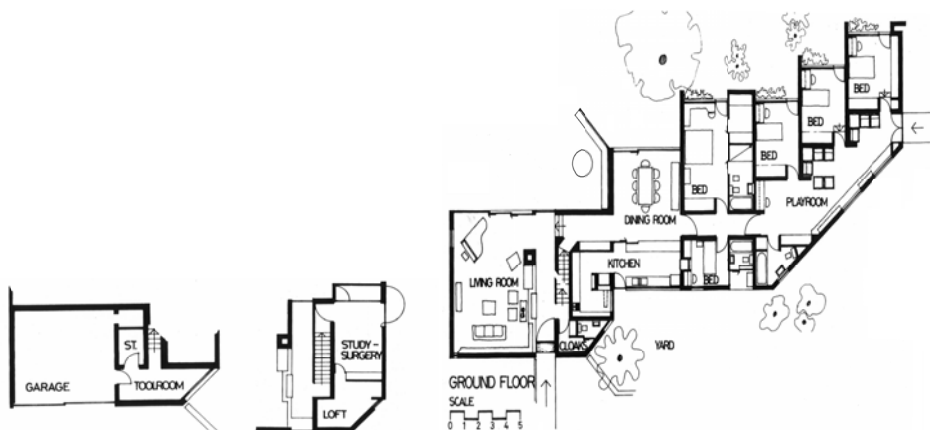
Previous page: House Raynham, Newlands, Cape Town (1967), lower ground, first and ground floor plans (Fagan archive, undated). Top left: Approach view (Fagan archive, undated). Top right: Interior view of children's playroom (Author, 2008). Bottom: View from garden (Author, 2008).
